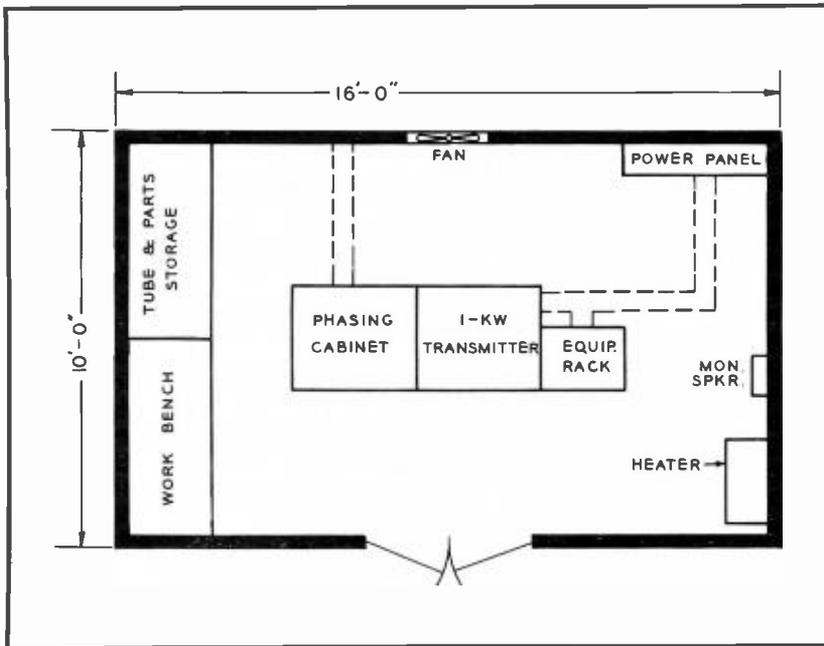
This is the transmitter building floor plan for a 1-KW remote-controlled operation. Space has been reduced to a minimum, however, sufficient room for the equipment and for servicing is provided.
